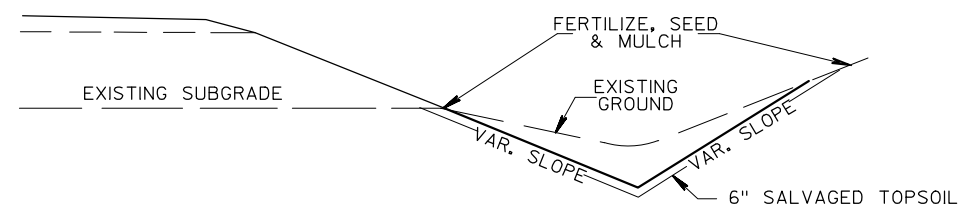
DETAIL FOR EXCAVATION BELOW SUBGRADESECTION A-A
